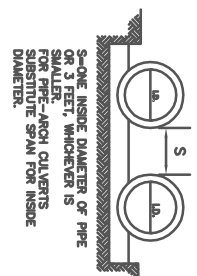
DETAIL OF TRENCH CONSTRUCTION FOR SIDE DRAIN AND MEDIAN DRAIN PIPE
